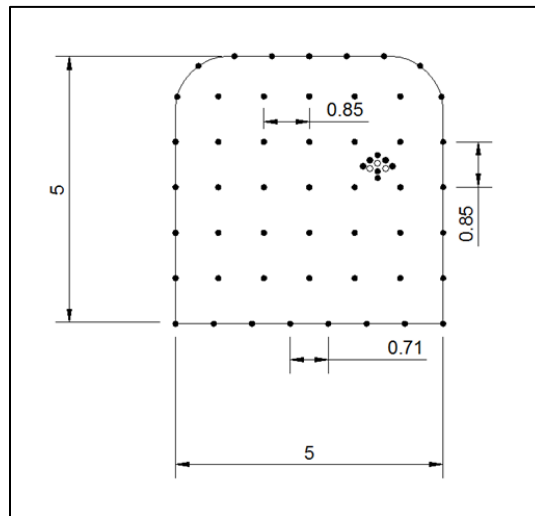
Drilling Pattern for a Typical 5 m x 5m Heading Section View
